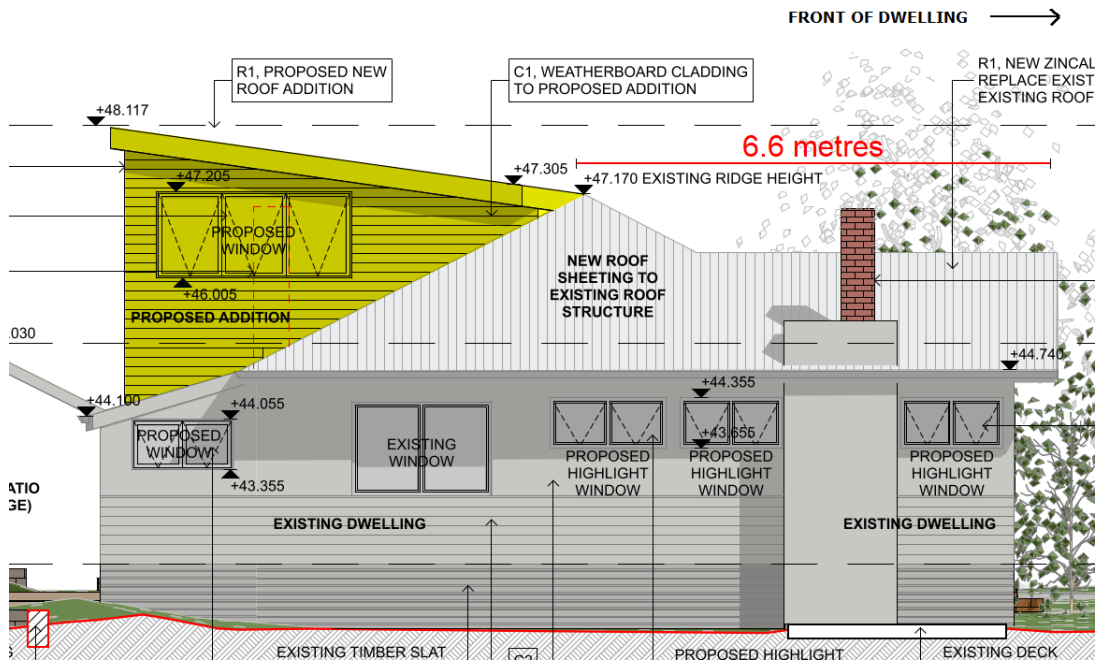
Amended plan extract illustrating relocation of second storey addition.
